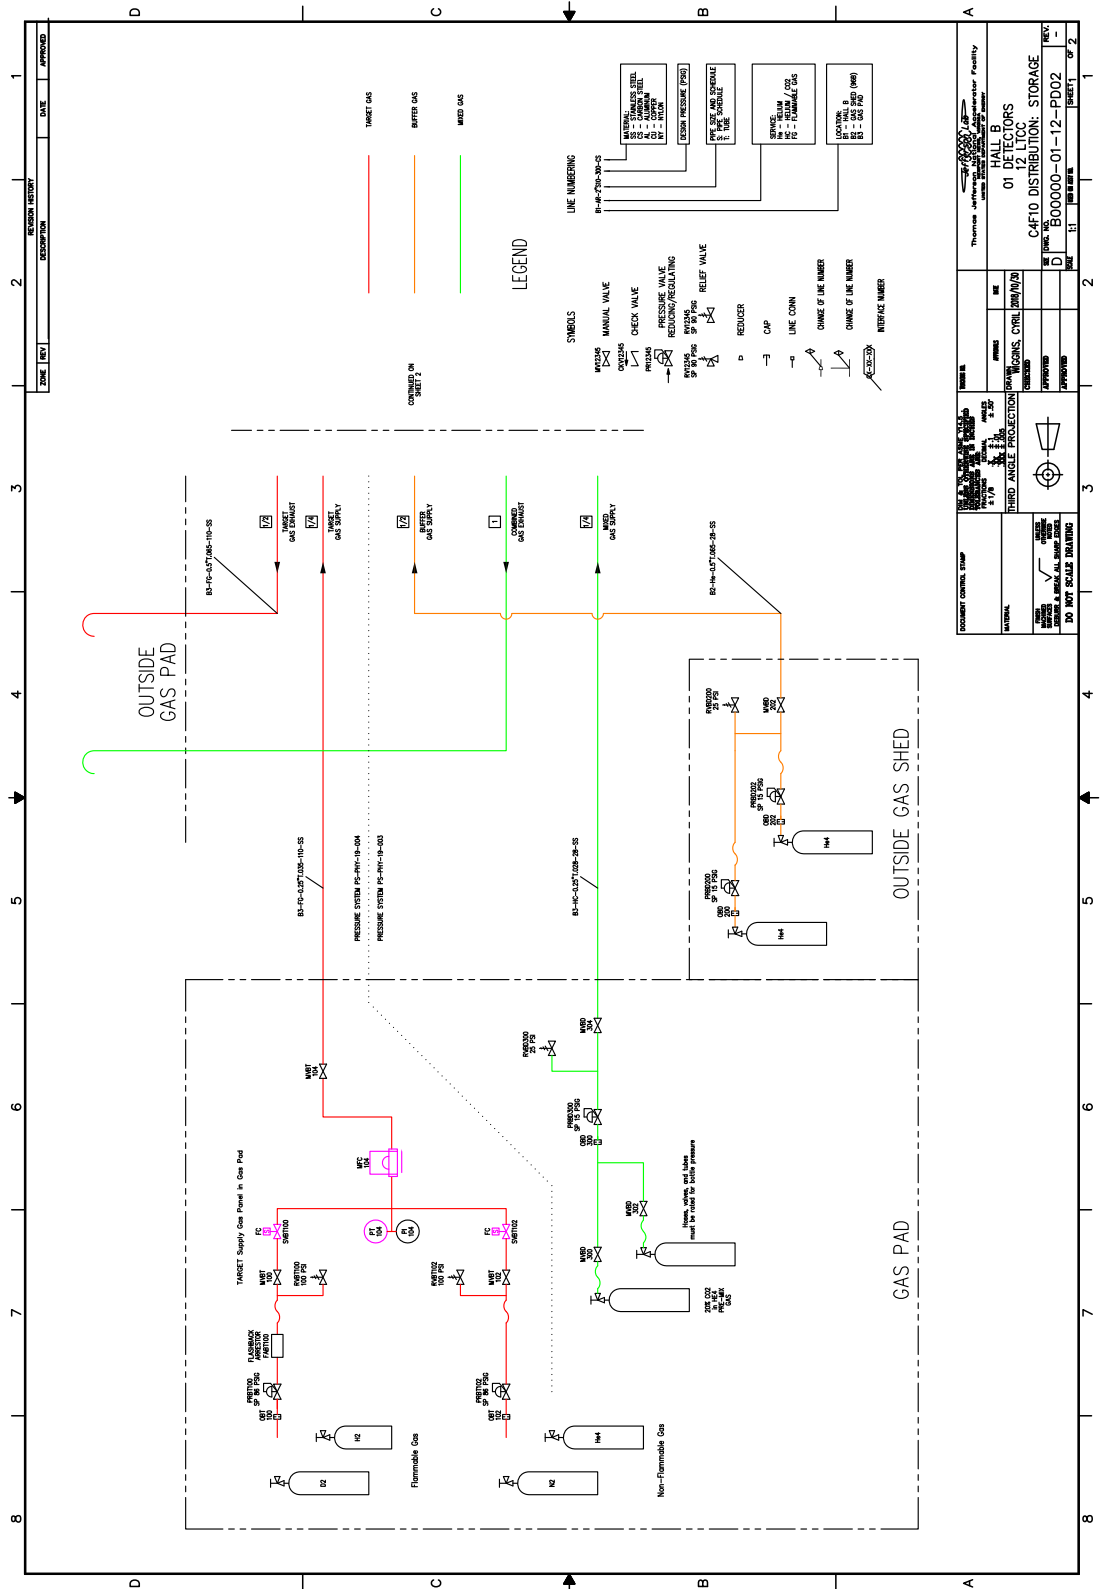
CAD scheme of the gas supply system. Draw by R. Miller.
